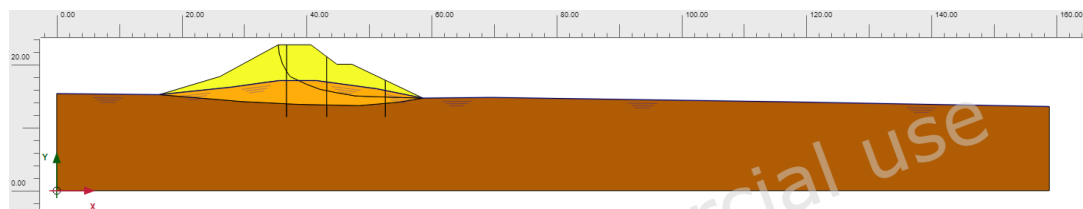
Initial cross-section used in linear elastic modeling of Uetsu Railway Embankment
